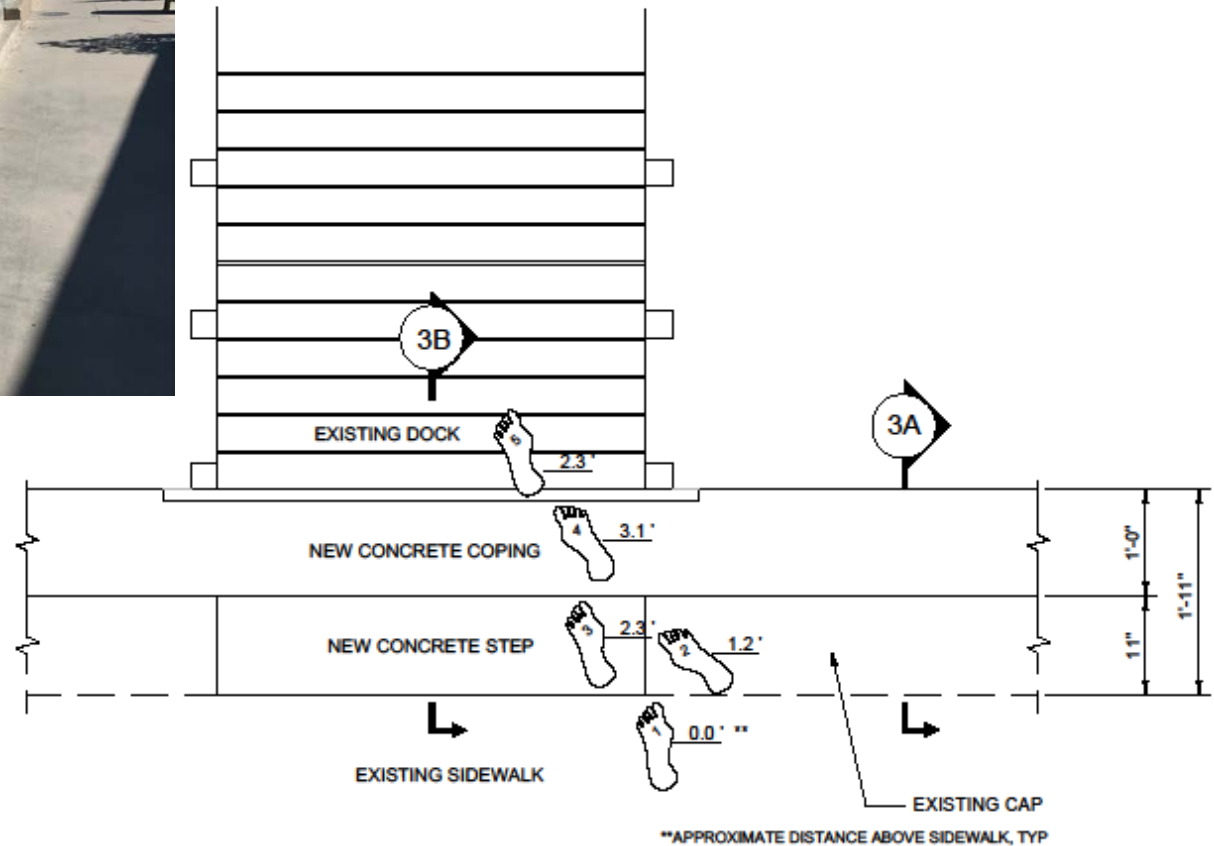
EXHIBIT C – PLAN VIEW SHOWING NEW CONCRETE STEP AT PRIVATE DOCK
